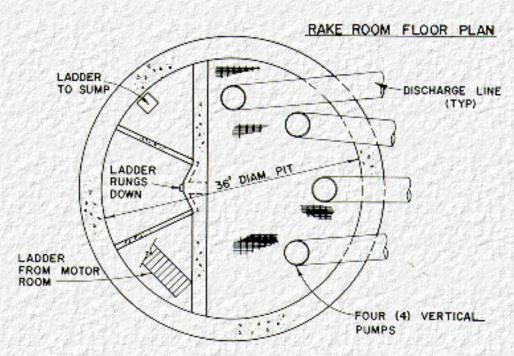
Large Wet-Pit Type Pump Station - Plans
